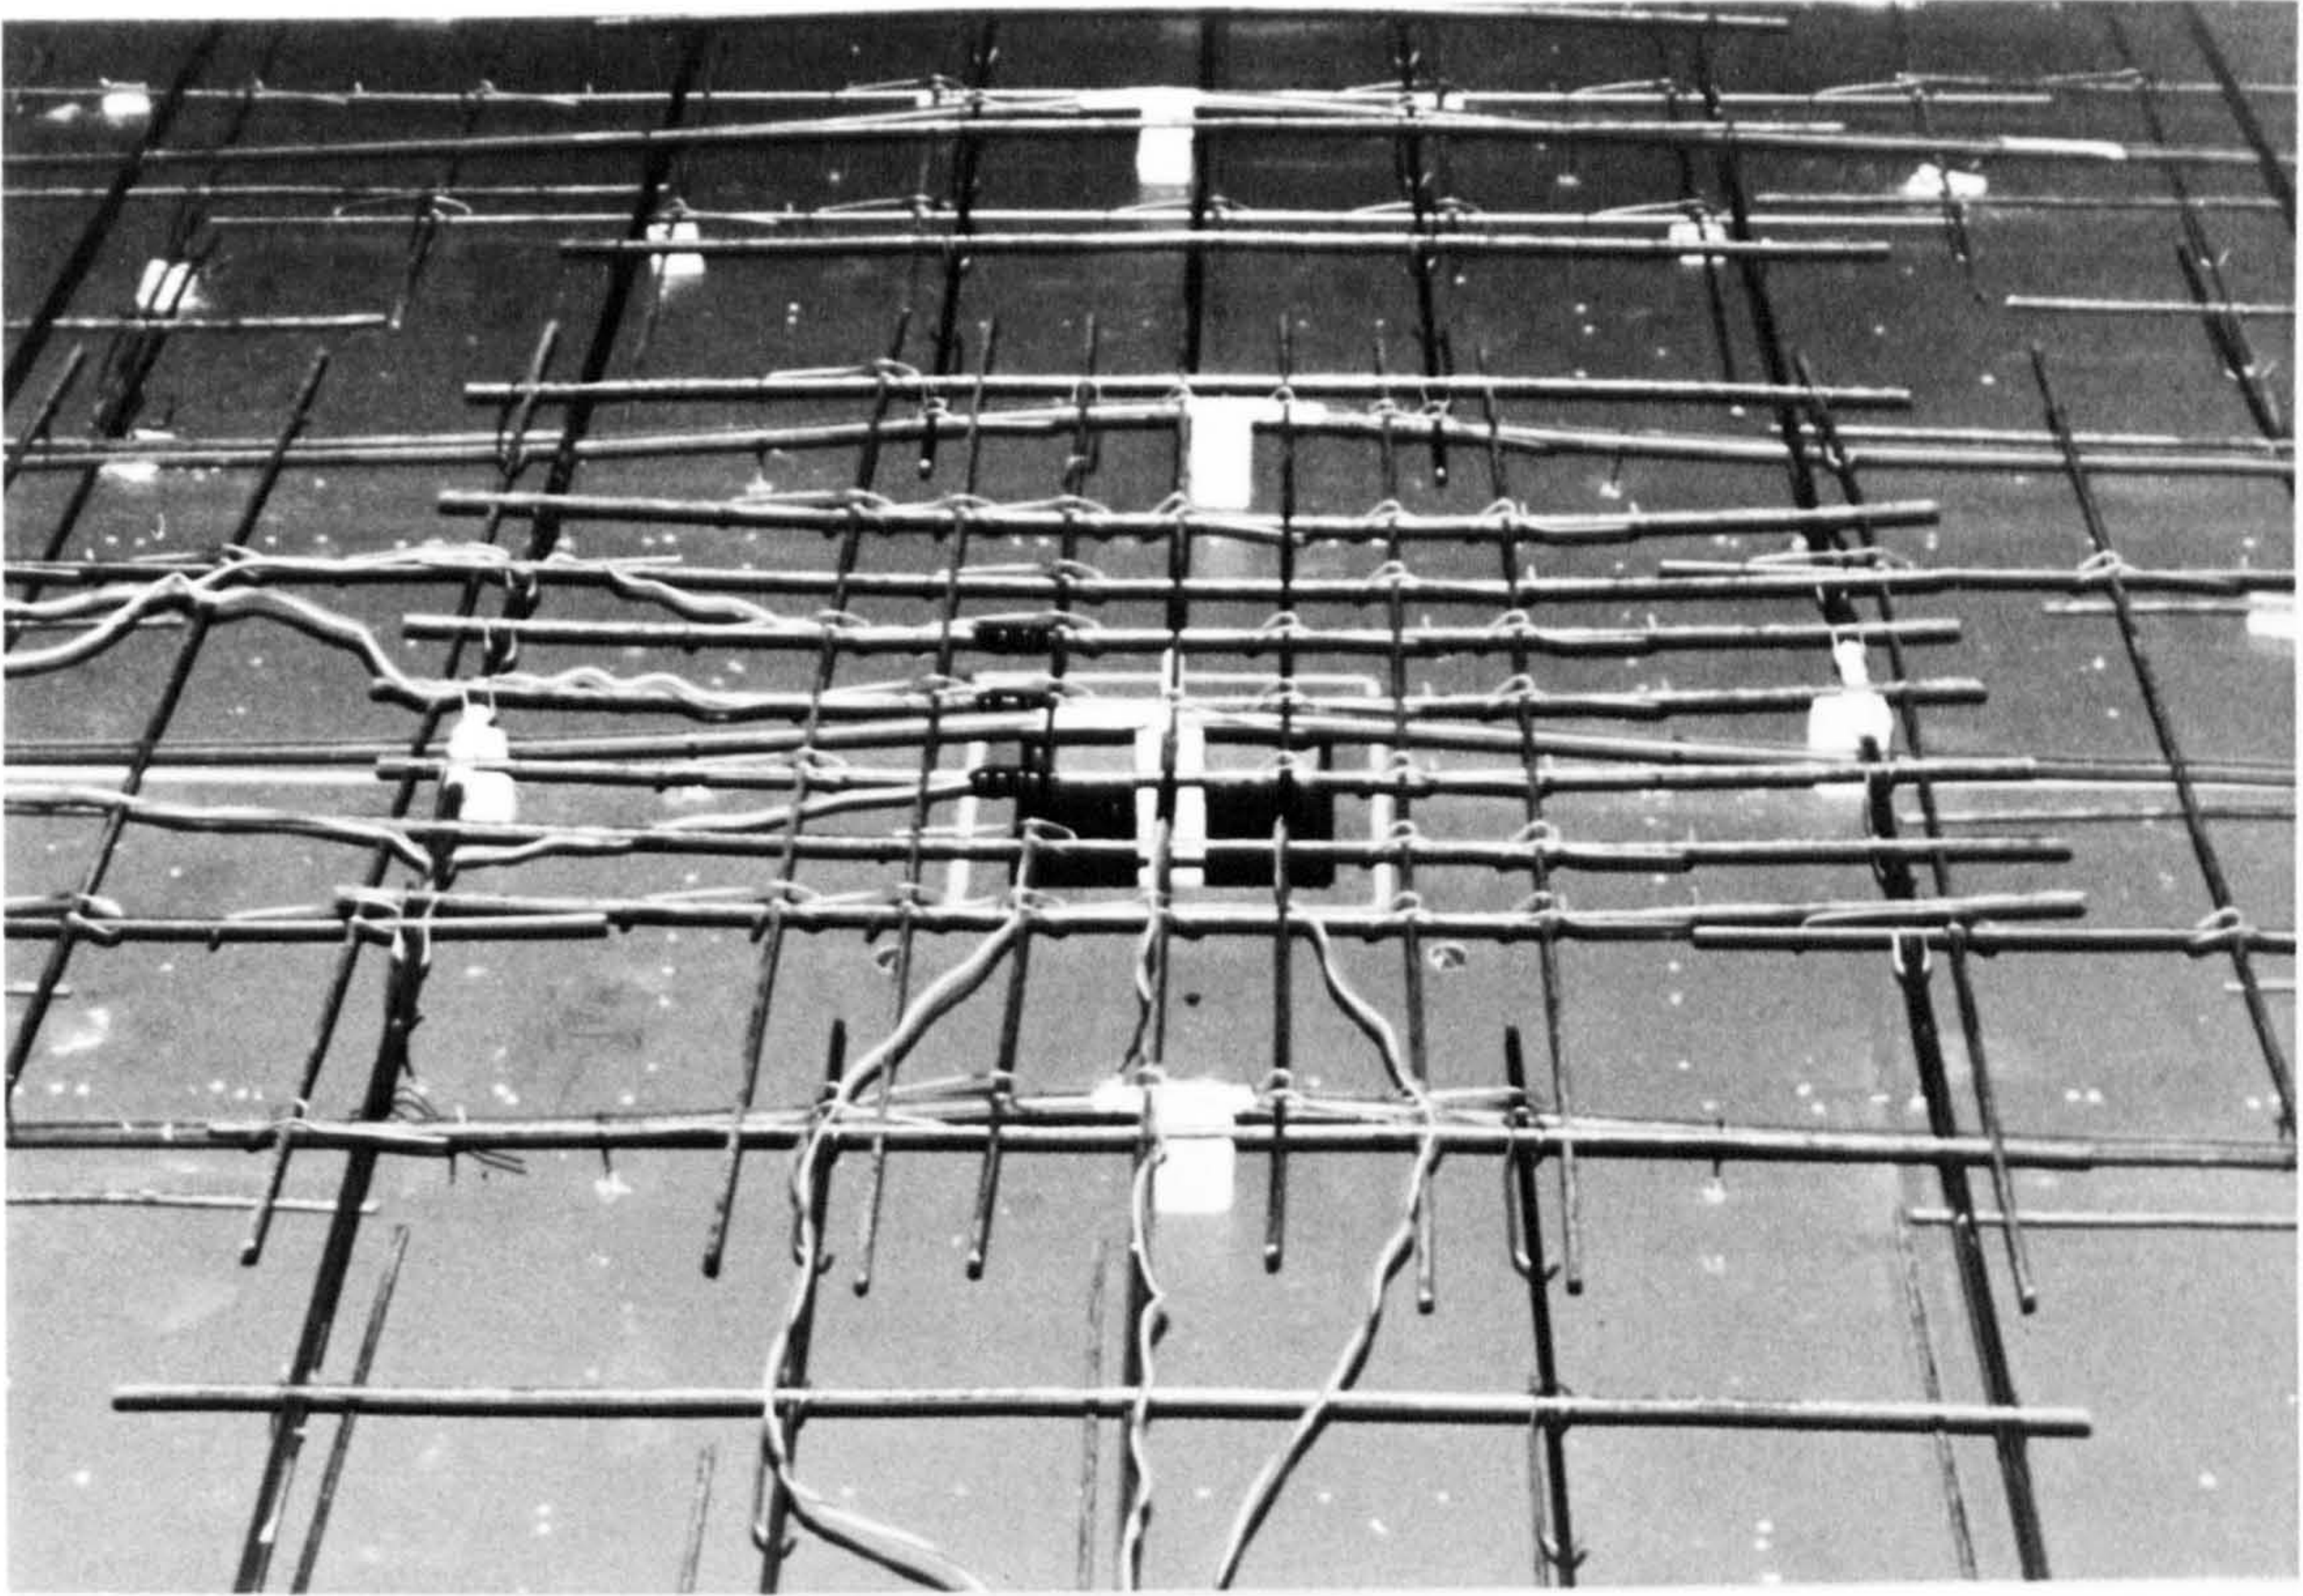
Column non-prestressed reinforcement (B 1 to C 1)
